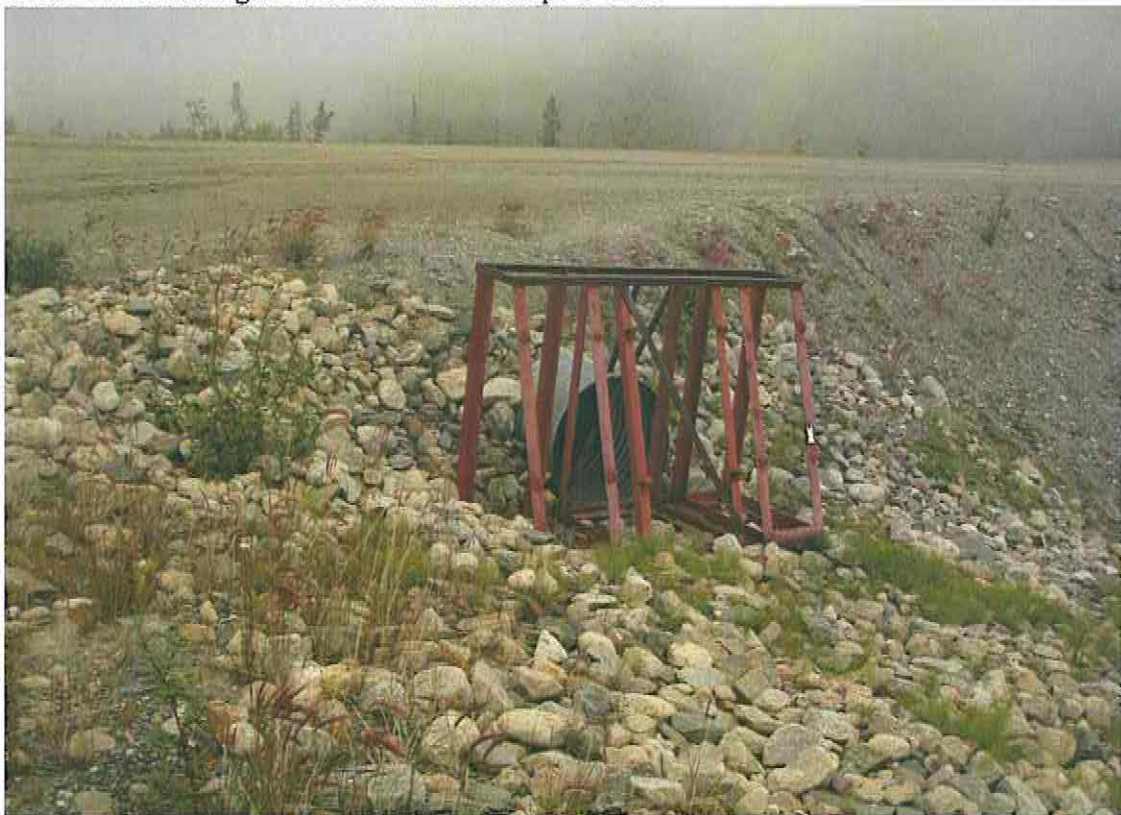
Emergency culvert (inlet) at Little Creek Pond
